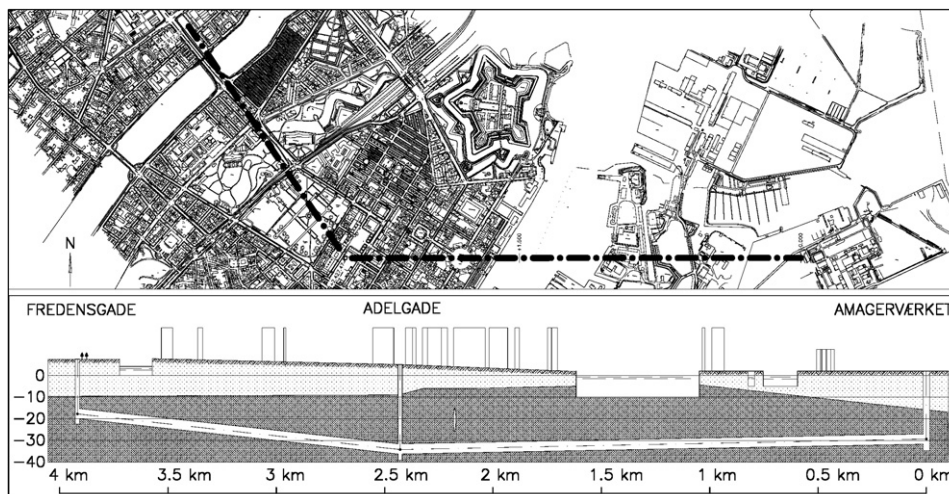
Layout of the district heating tunnel in Copenhagen.
